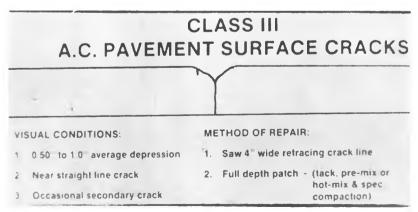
Our design method of repair was to saw out a 4-in. wide trench, retracing the crack line, and to make a full depth patch with a tacking, premix, or hot mix by standard compaction methods.
